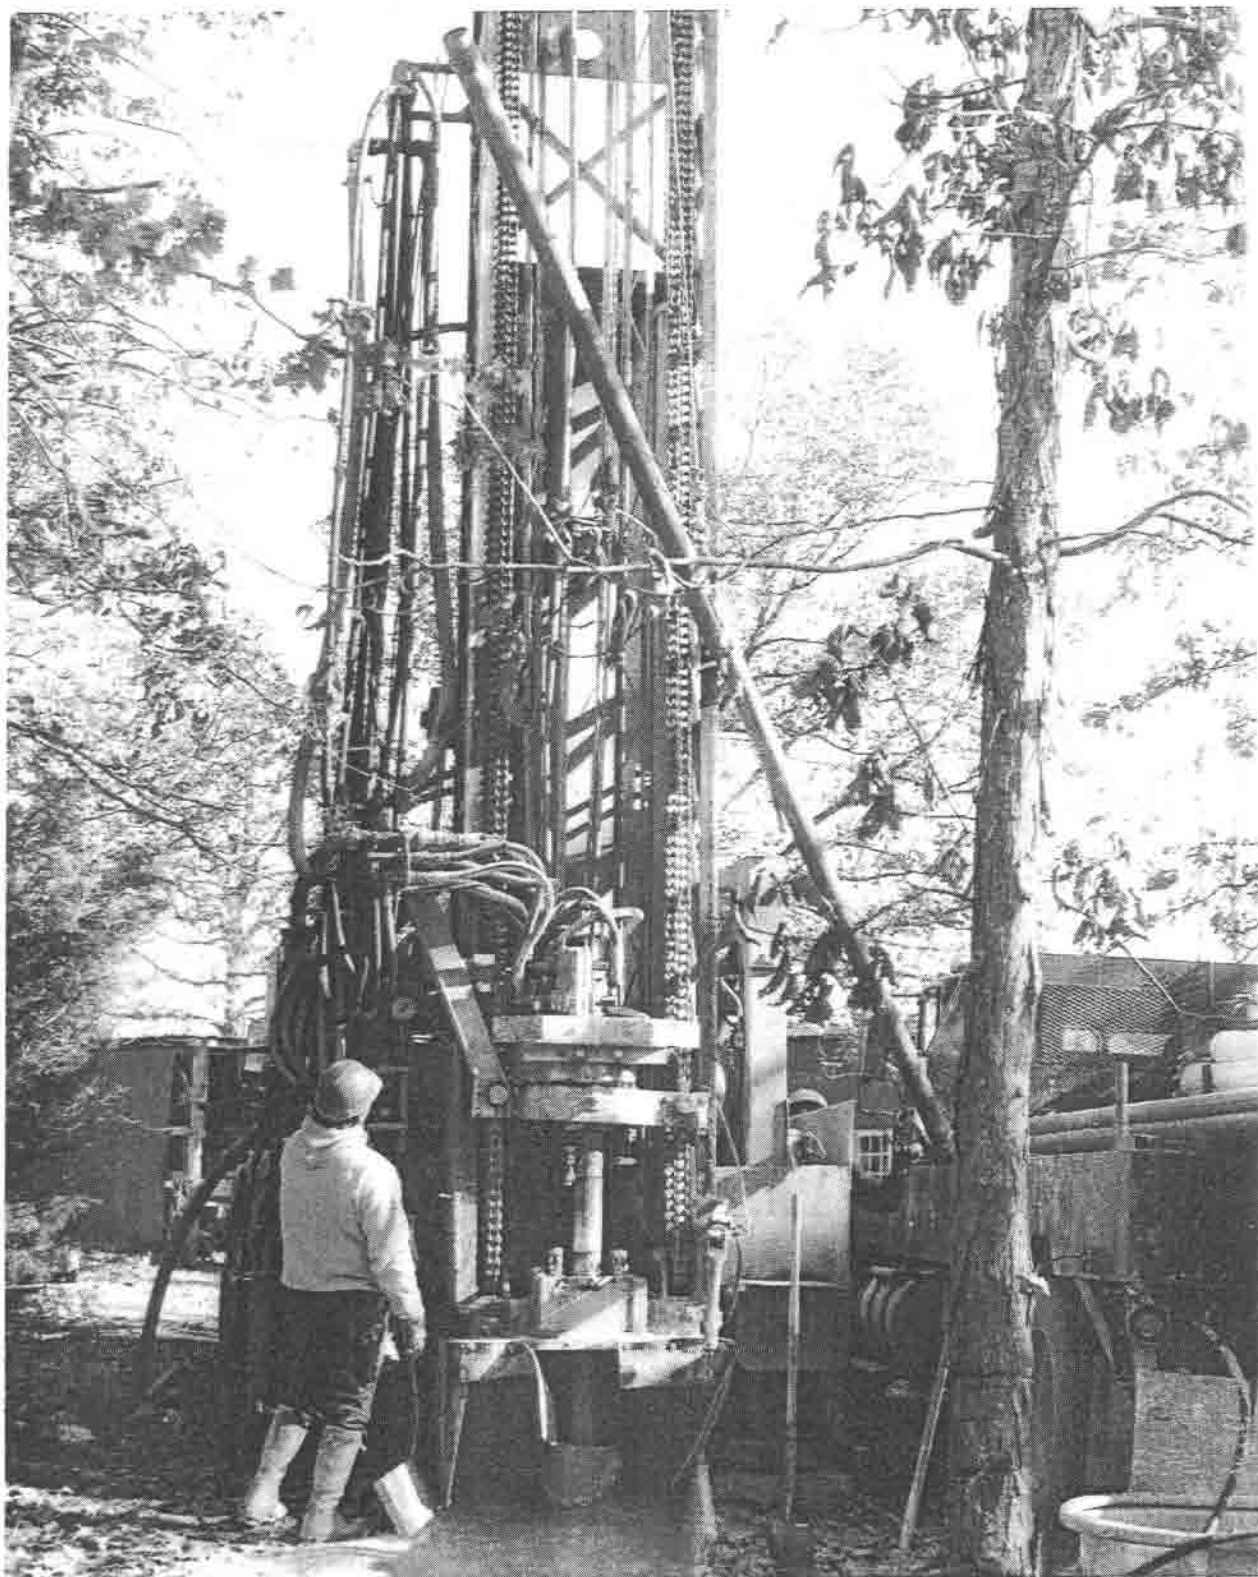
Rotary drilling rig. Photo by Jim Vandike.
